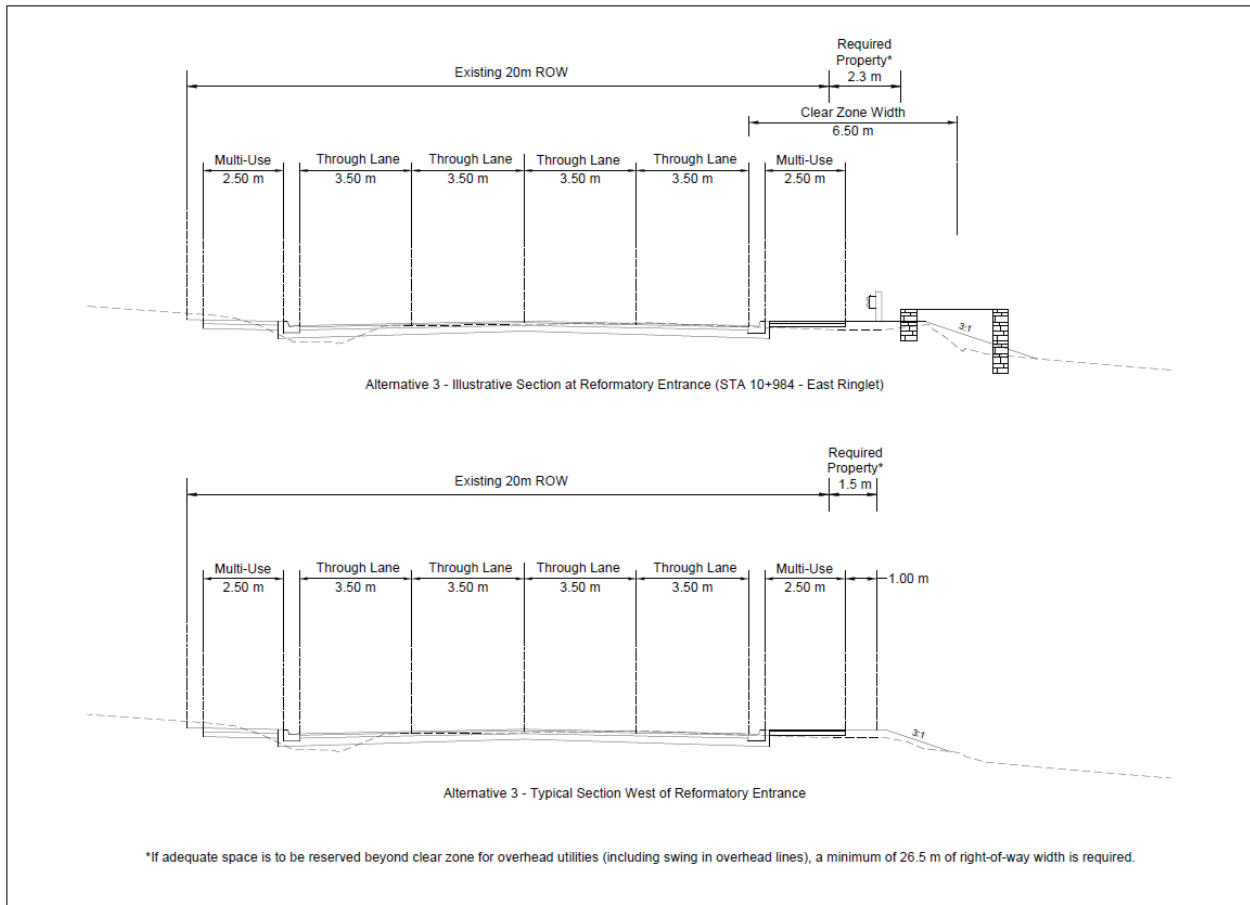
Typical Roadway Cross-Section for York Road Alternative 3.
